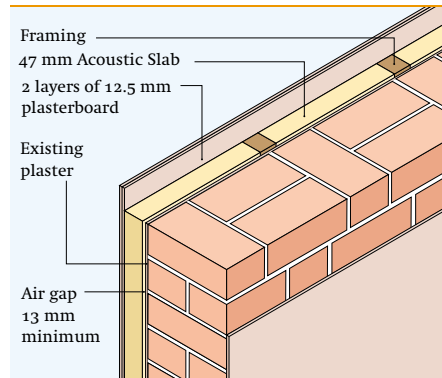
Acoustic Slab as acoustic insulation to single brick separating wall
